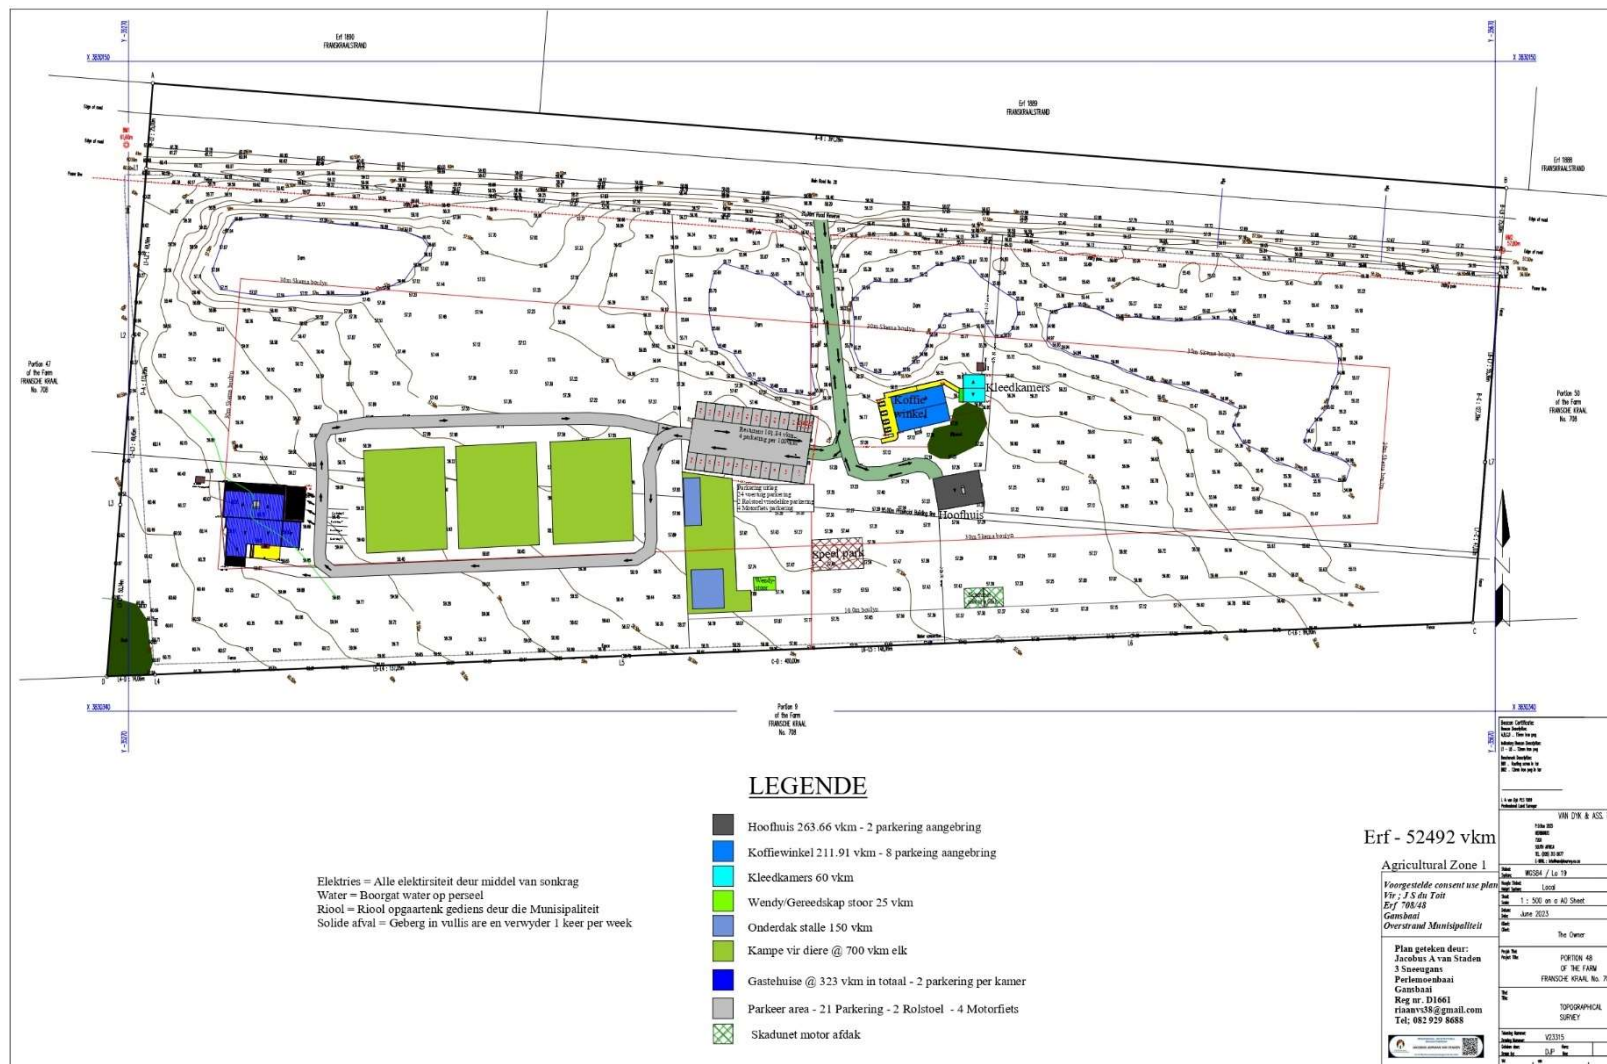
Site Plan showing the layout of the proposed tourism facilities.
